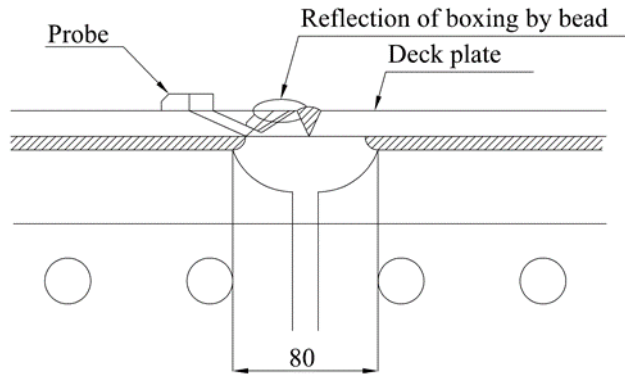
Inspection of Deck Plate Welded Portion by Ultrasonic Flaw Detection
